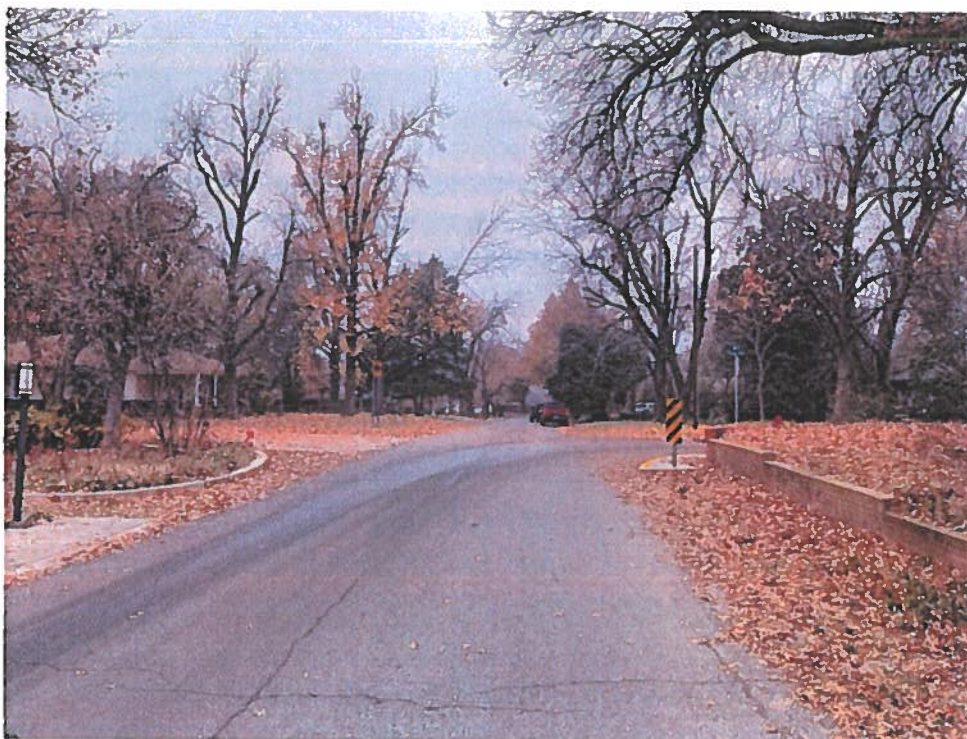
Standing in front of 902 Hoover and looking East along Hoover Street towards the intersection with Flood Avenue
